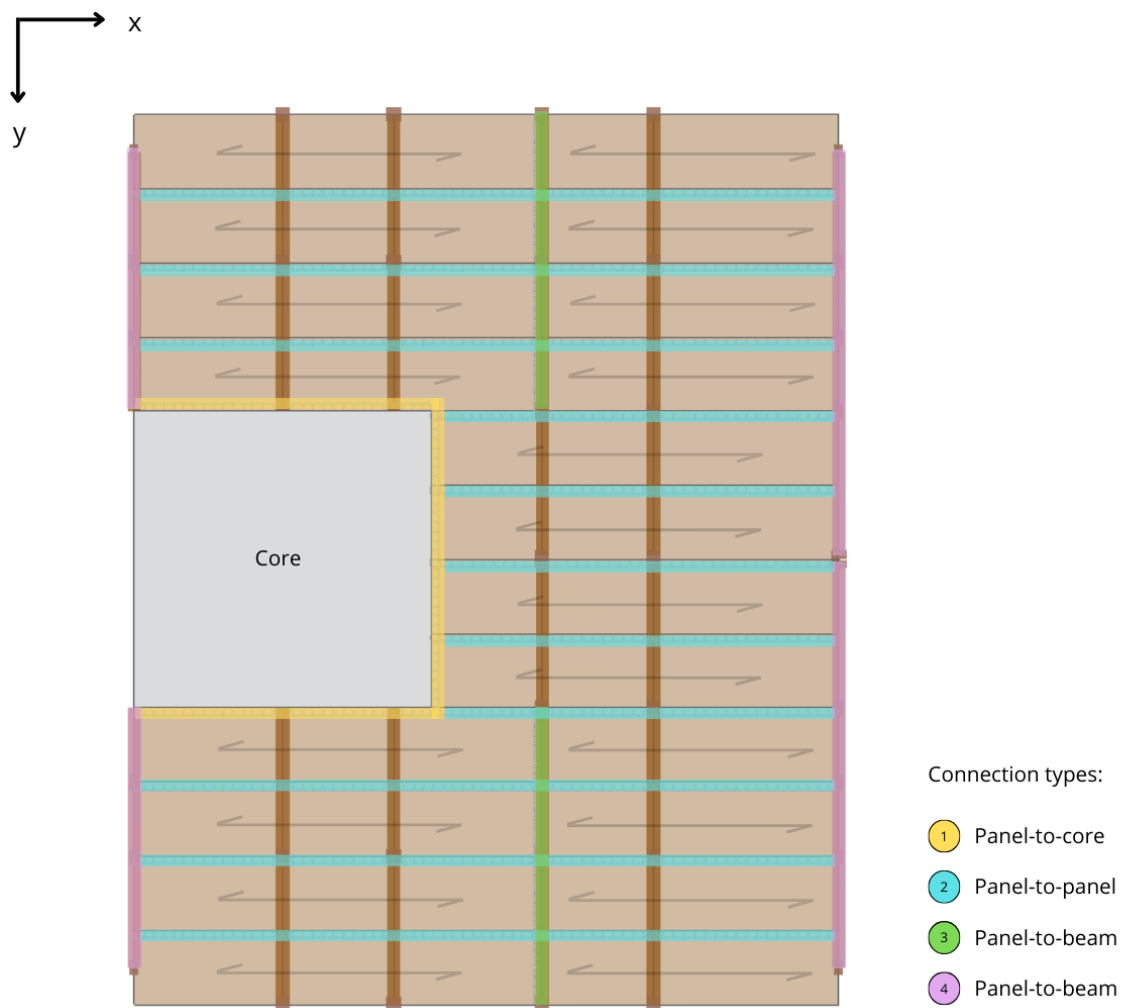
Floor plan with demarcation of the connection types considered in the case study.
